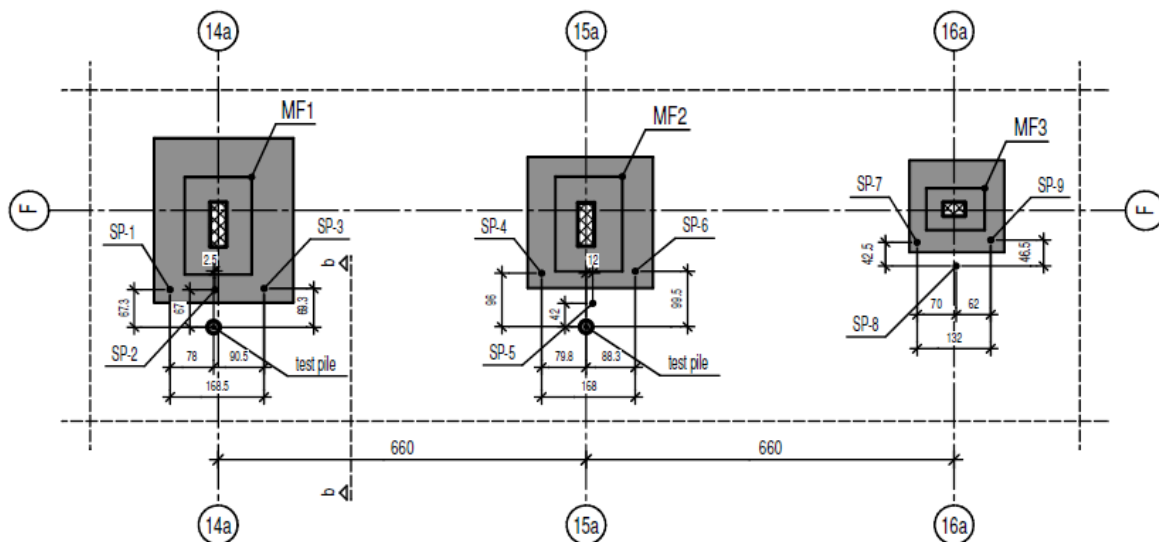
Plan view of the settlement measurement gauges (SP) location (unit – cm).
